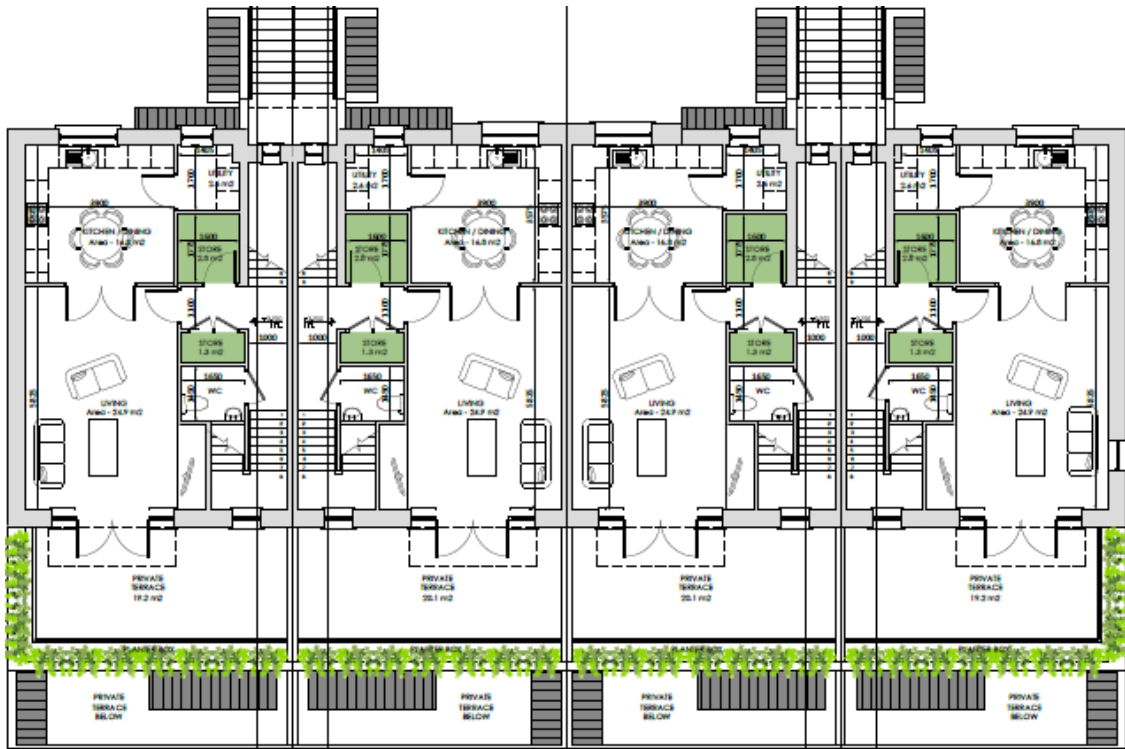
Proposed first floor plan of Duplex Apartment Block J.
